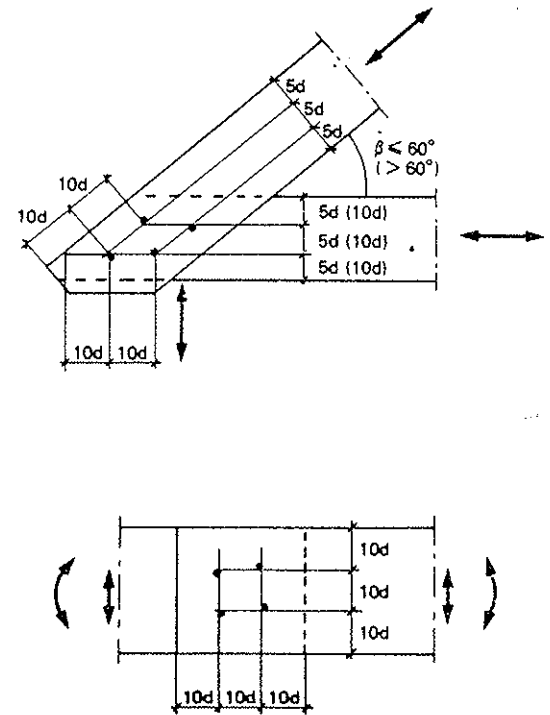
2221: Minimum space between nails and from nails to end and edges of timber.
